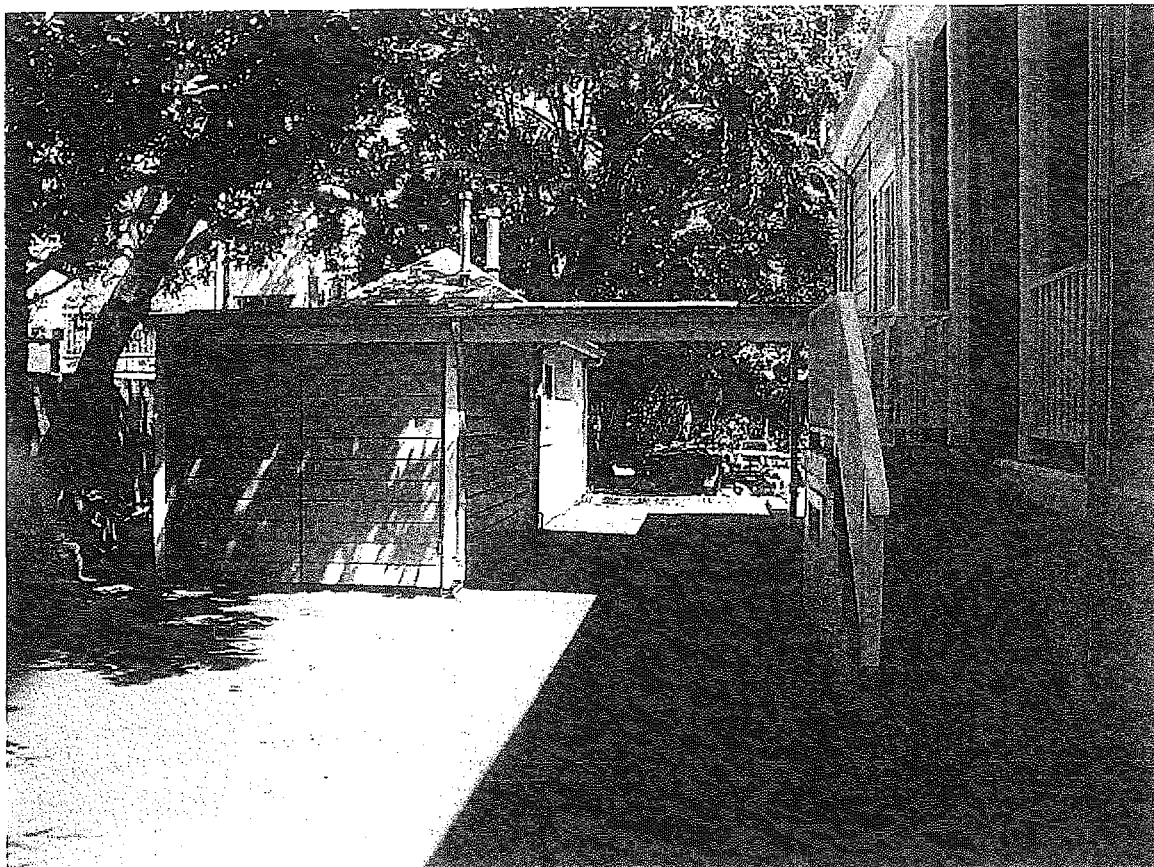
Separate laundry/garage building. This was built as part of 1989-91 renovation of the back apartment. At this time all water heaters, washing machines and dryers were moved out of the main house to the new laundry/garage.
